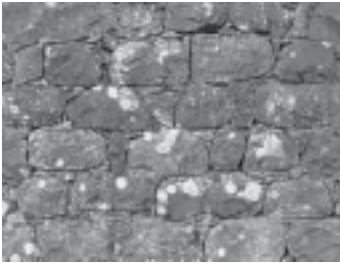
Lagwyne Castle: Detail of south-west wall.
